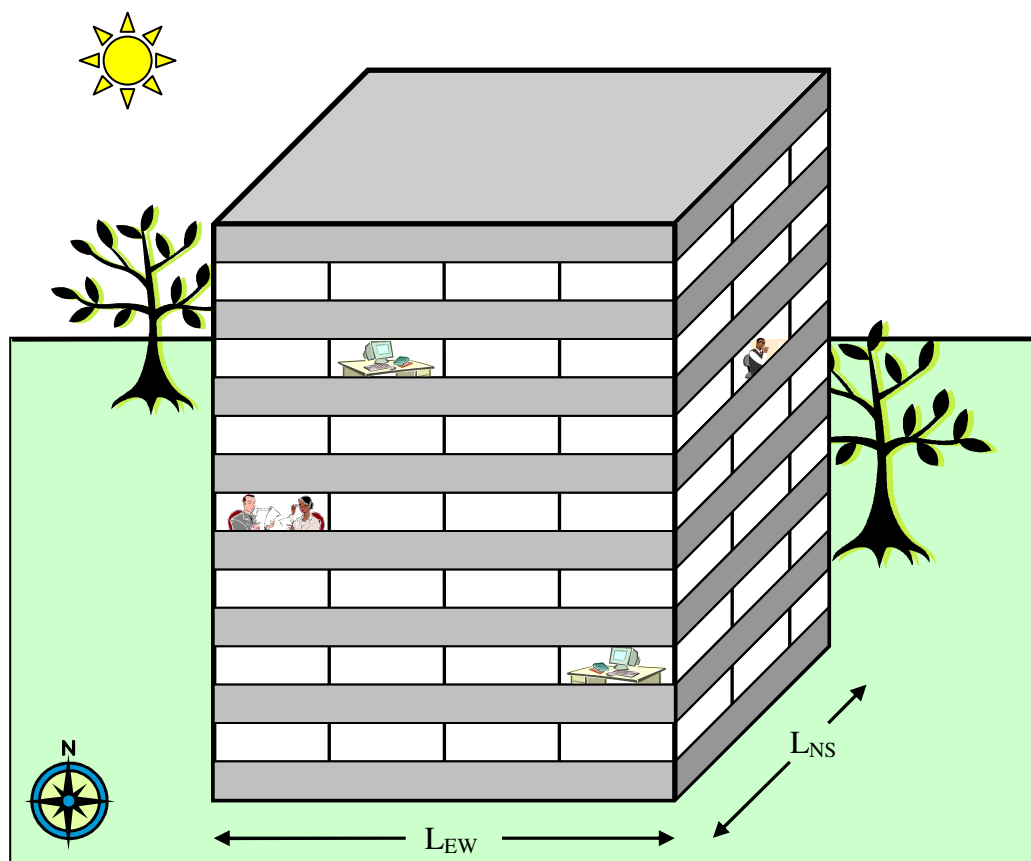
Multi-storied rectangular building, 50% glazed façade.
